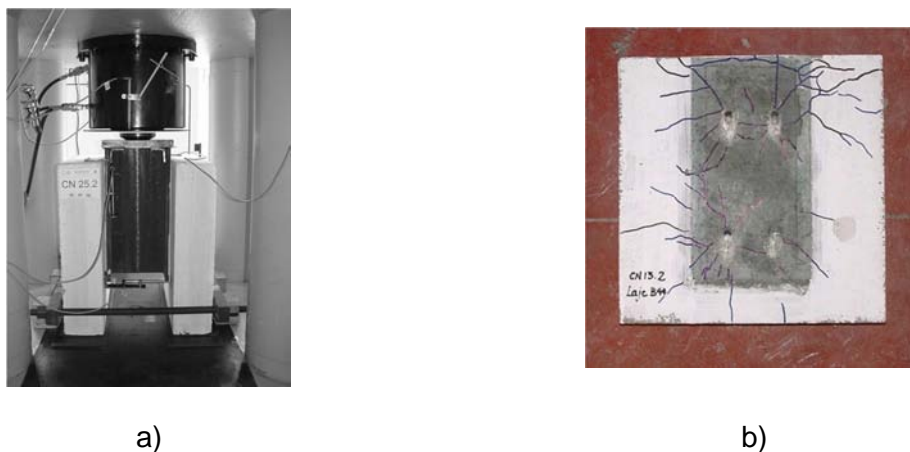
Laboratory tests [188]: a) testing frame; b) failure pattern on concrete slab.
